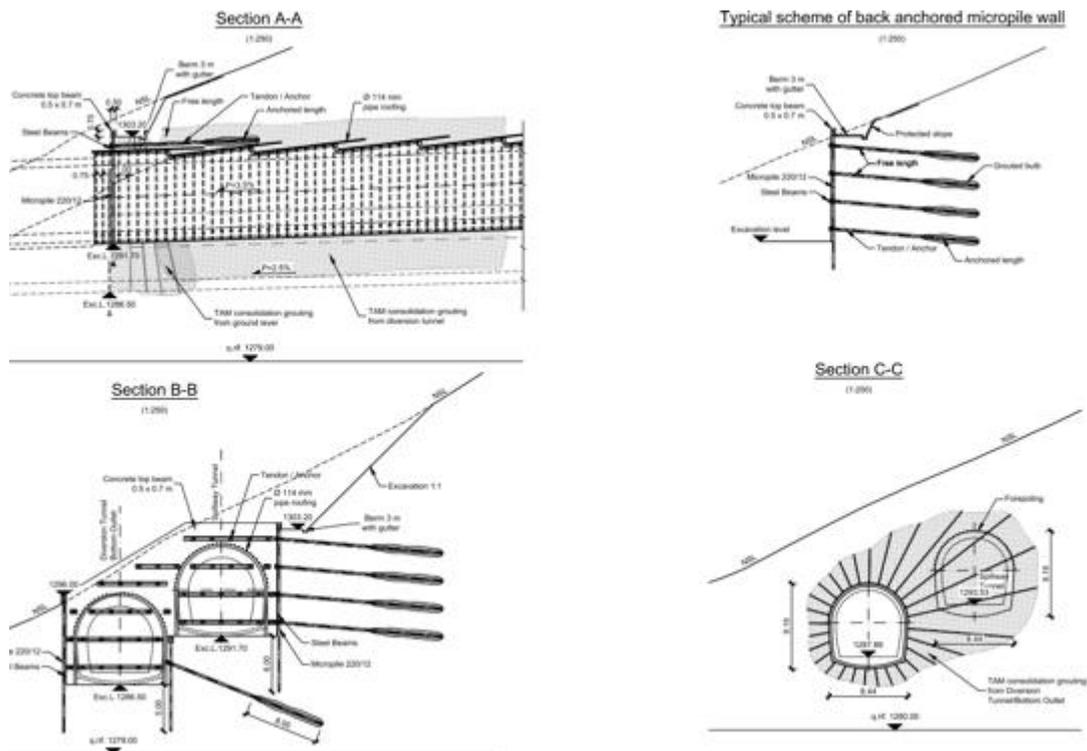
Downstream zone of the Bottom Outlet and Spillway Tunnel
